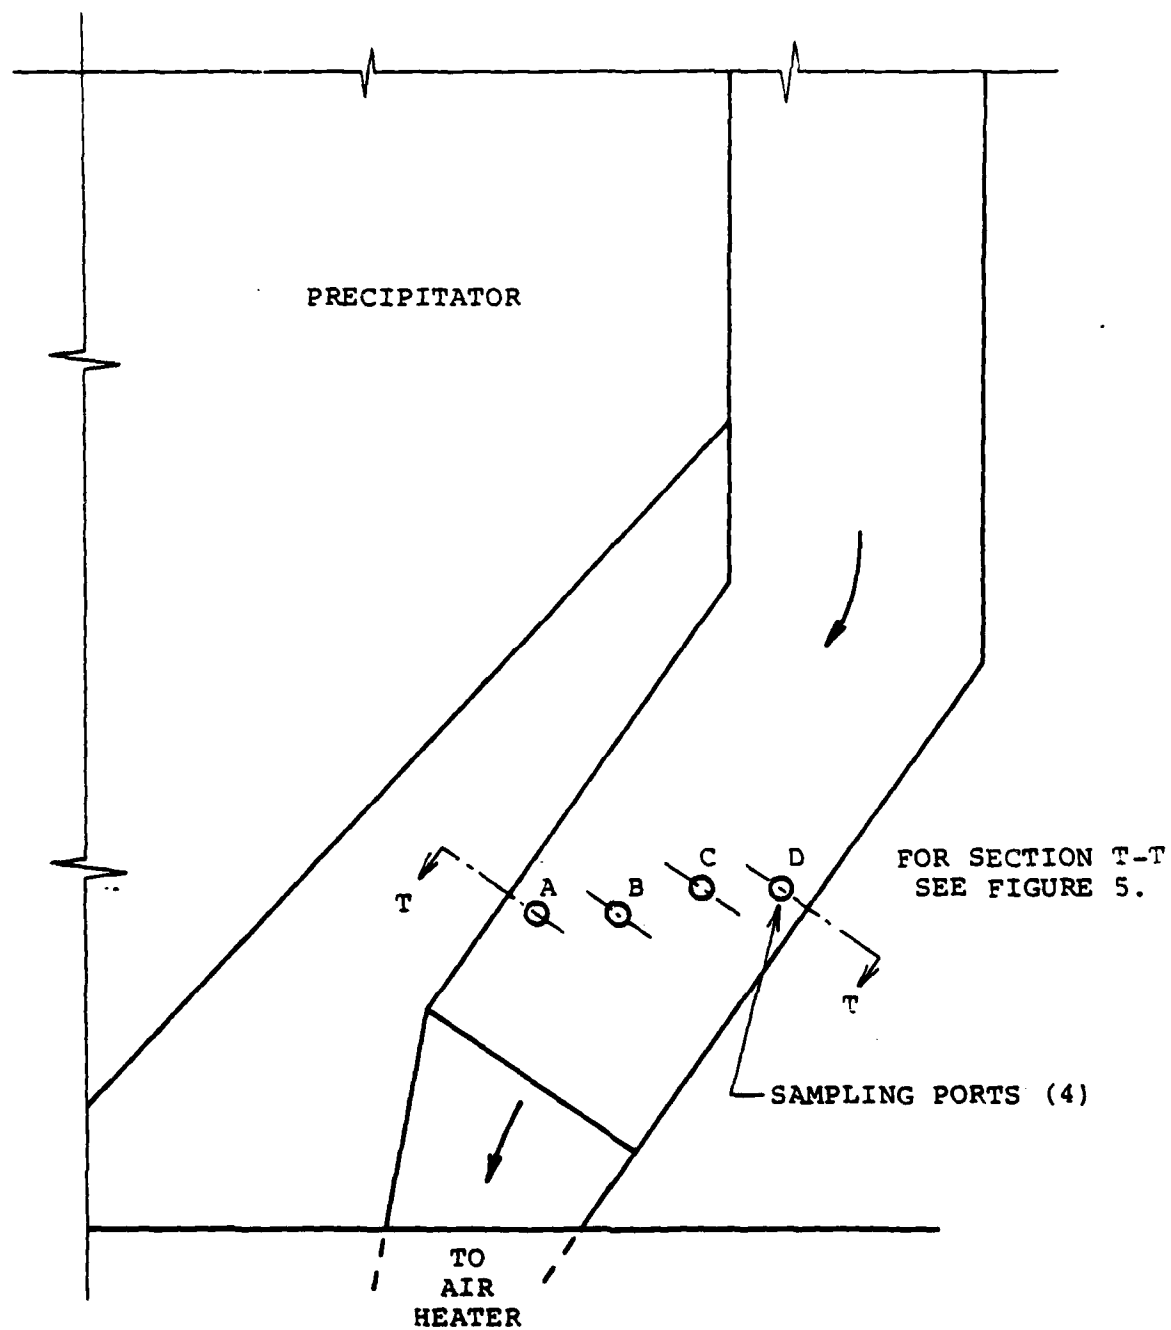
OUTLET DUCT CONFIGURATION SHOWING SAMPLING PORT LOCATIONS
